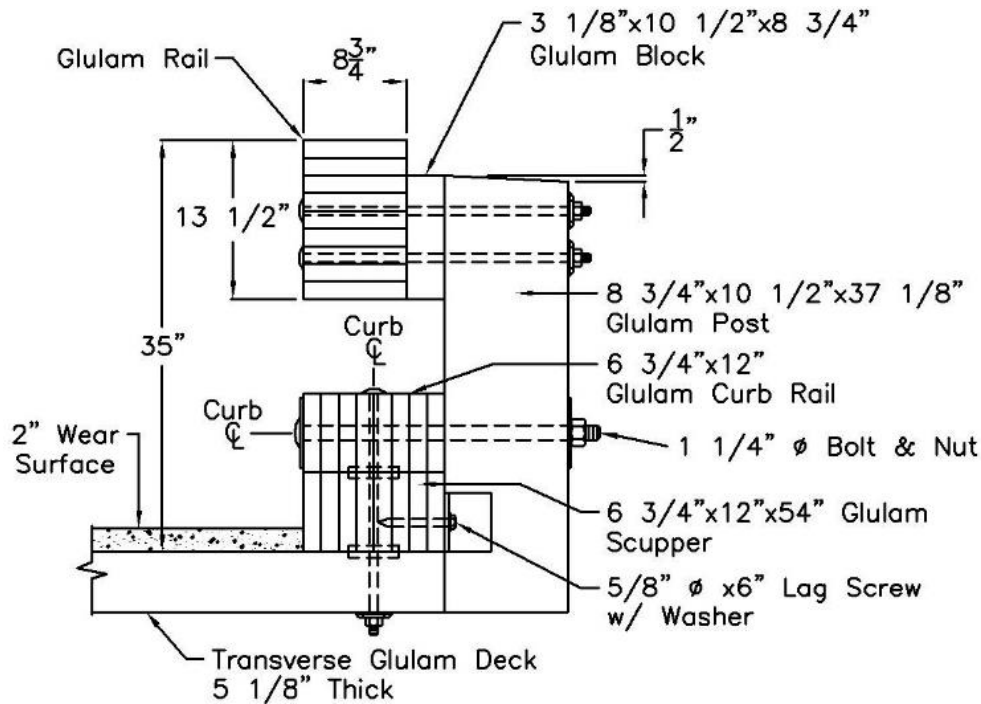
Side-View Schematic of NCHRP Report 350 TL-4 Glulam Timber Rail with Curb Bridge Railing [10-12]
